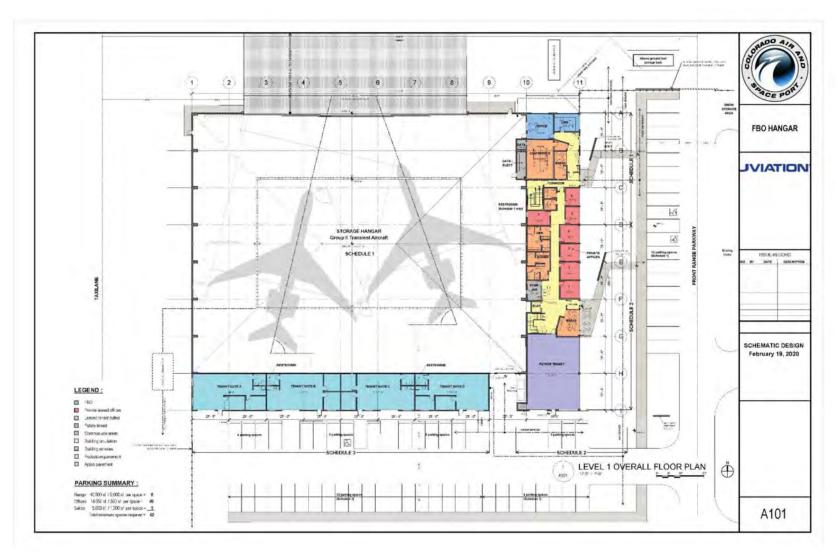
EXHIBIT "B" Premises – Module 2 Diagram and Site Plan – Site 1 on diagram
